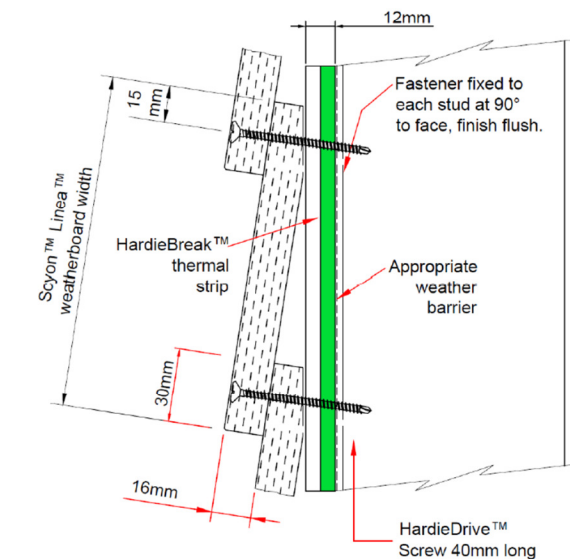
Face Fixing Detail (use when bracing capacity is required)
